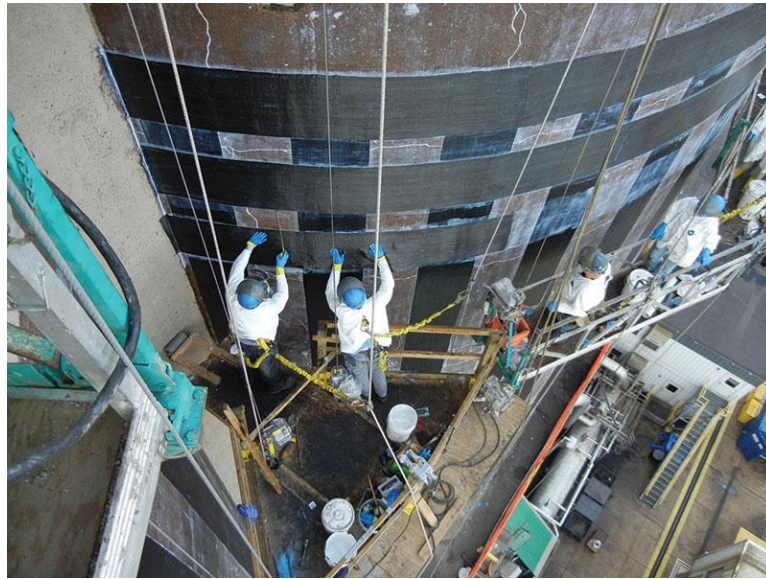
Application of CFRP to strengthen a steel cylindrical tank
